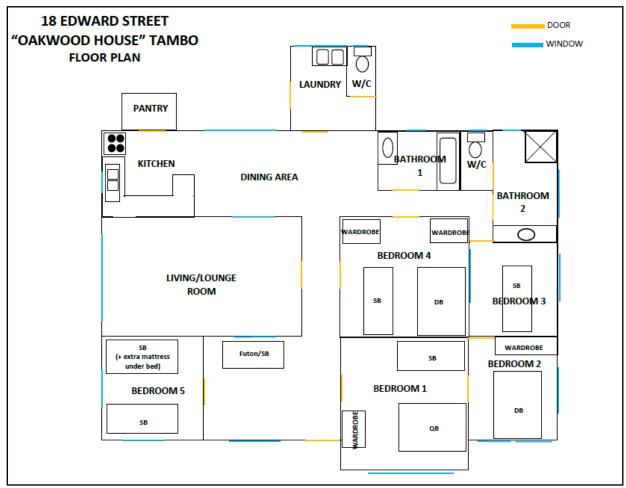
Oakwood House floor plan (Source: applicant supplied)
